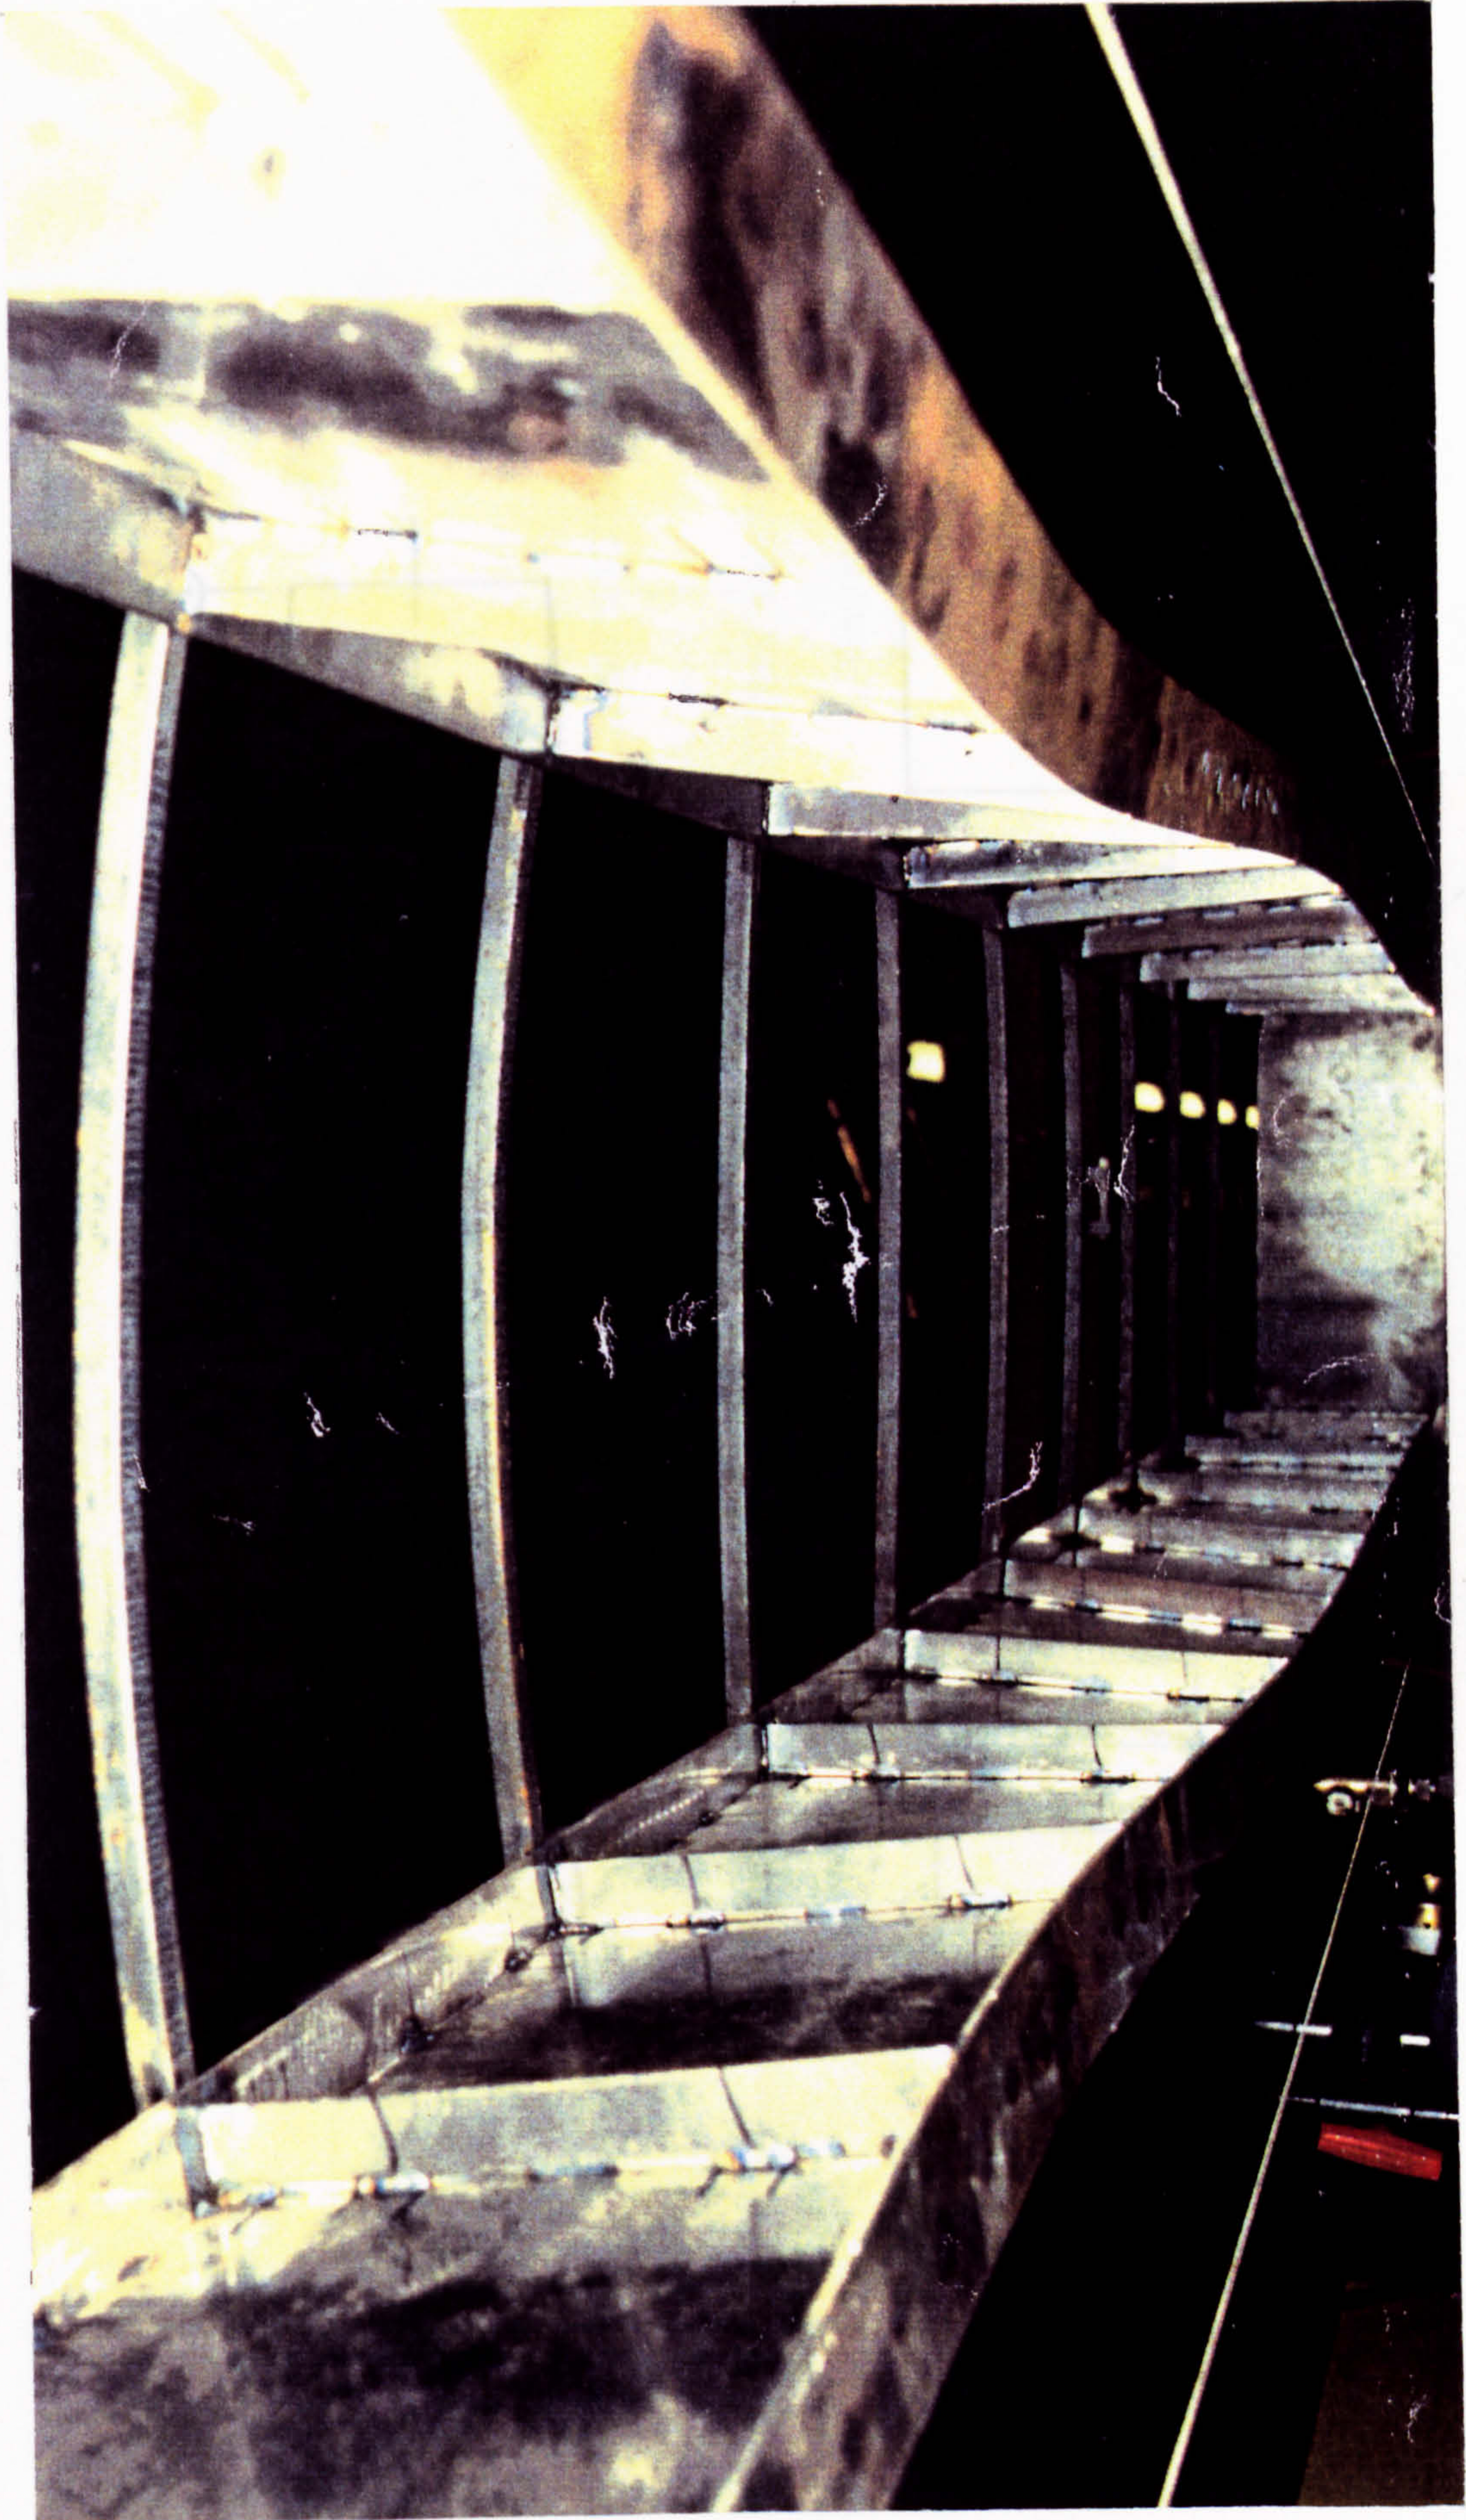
Onset of buckling for the Welding Institute test
